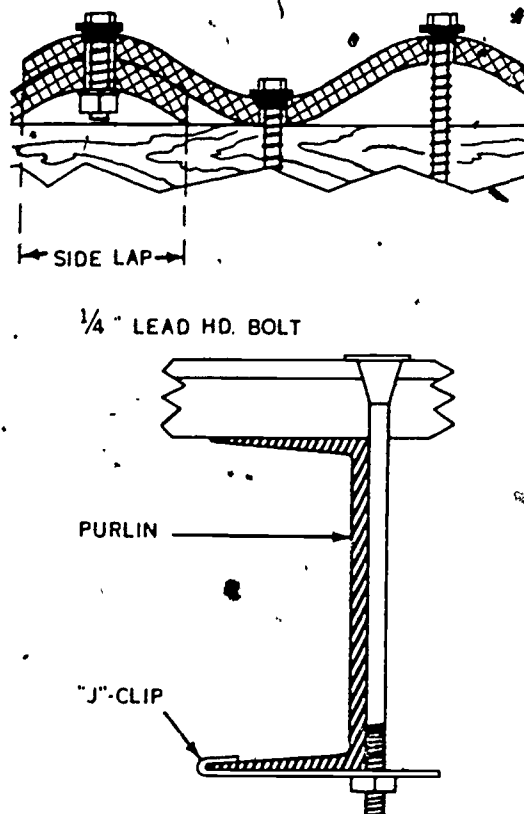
Fasteners for asbestos-cement corrugated roofing.
